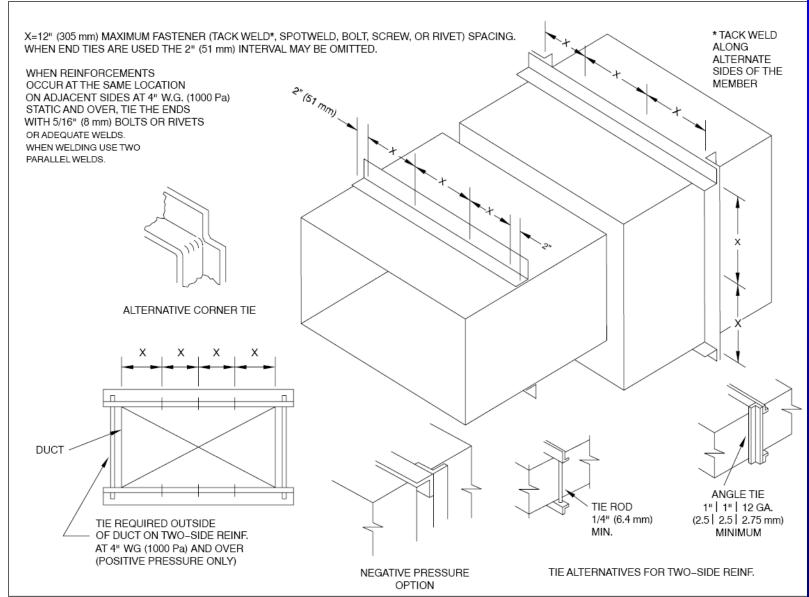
REINFORCEMENT ATTACHMENT
